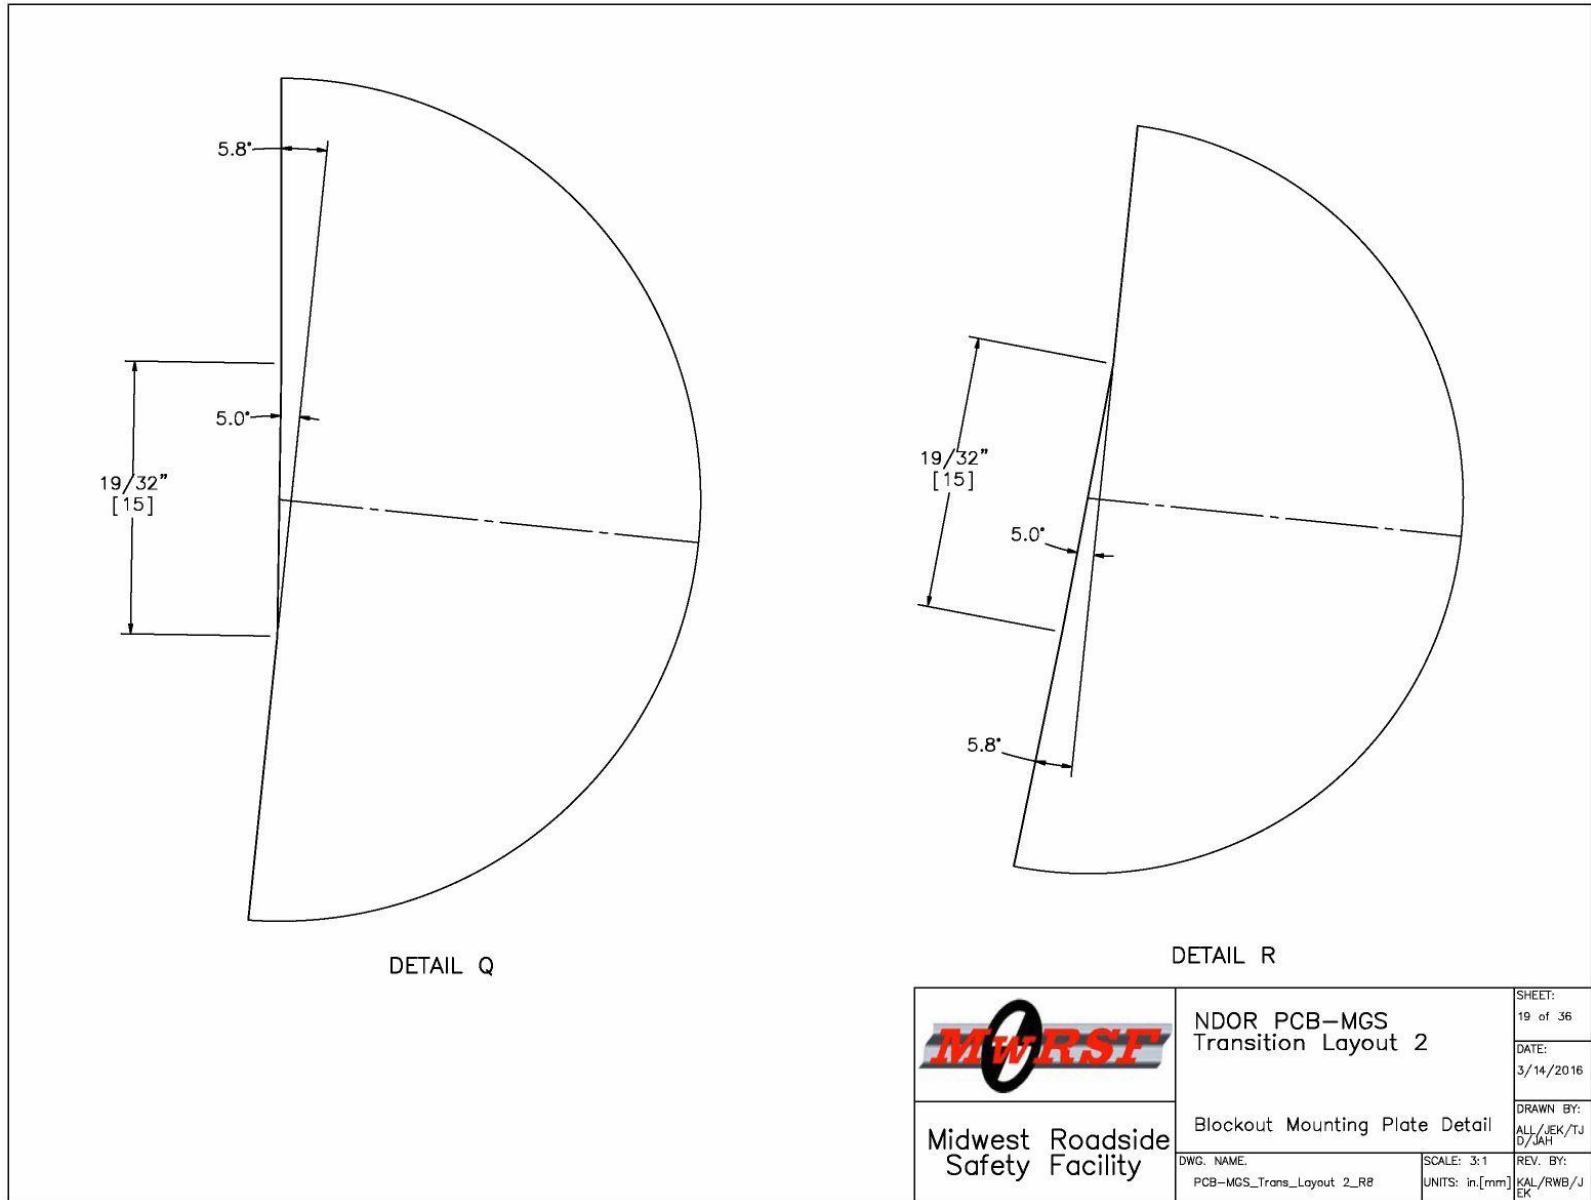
Blockout Mounting Plate Detail, Test No. MGSPCB-1
